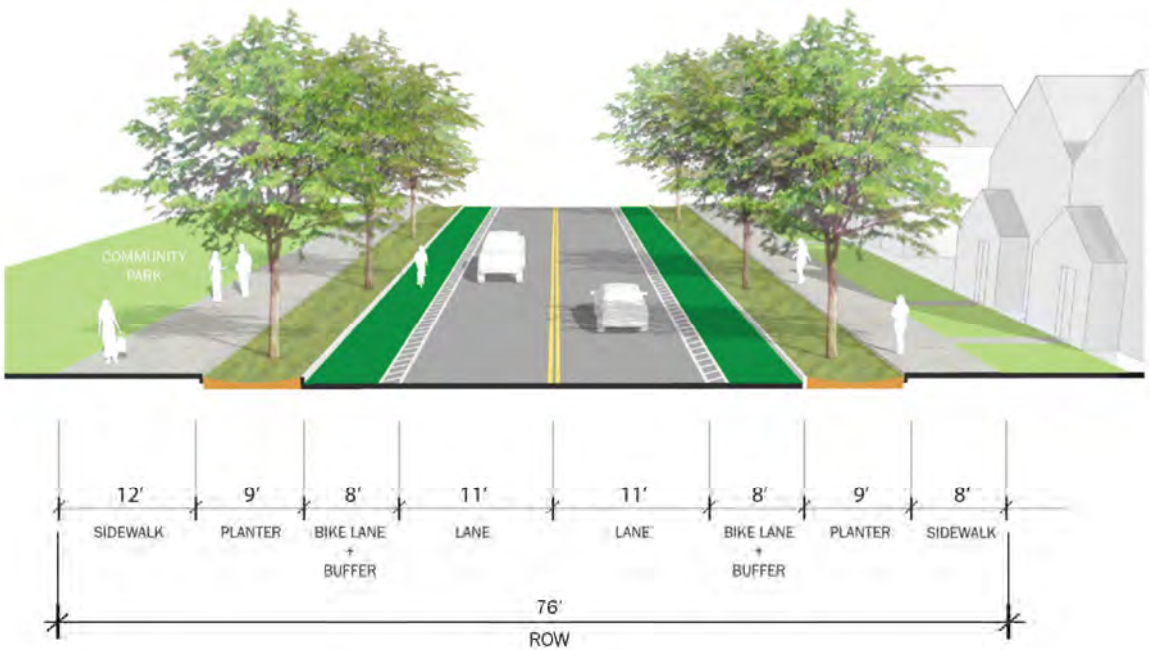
FROG POND EAST AND SOUTH MASTER PLAN CROSS-SECTIONS (CONT.)FROG POND BRISBAND MAIN STREET EXTENSION (RE-17)LOCAL STREET (SOUTH OF MERIDIAN CREEK MIDDLE SCHOOL)
